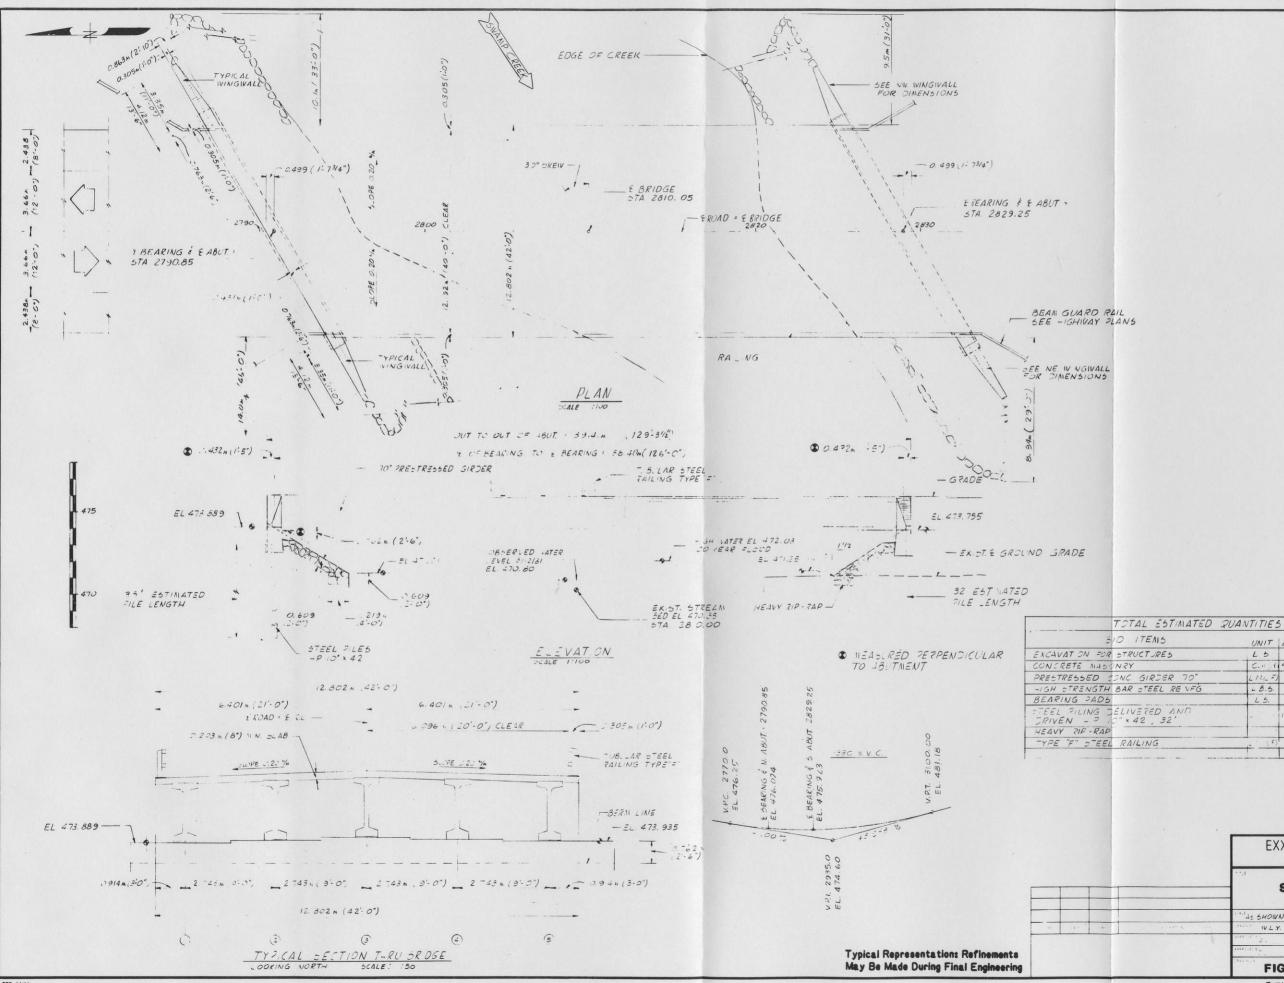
and 1.2-34, taken from the set of preliminary engineering drawings for the access road (Foth and Van Dyke Associates, 1982b), provide details of the road cross-section and the bridge structure crossing Swamp Creek. As the cross-section indicates, a 3-inch bituminous concrete pavement with an underlying 1-foot crushed aggregate base course is planned for the roadway section. The access road will be posted as a private road leading to the Crandon mine; however, no gates or guards are planned at the State Highway 55 intersection.
